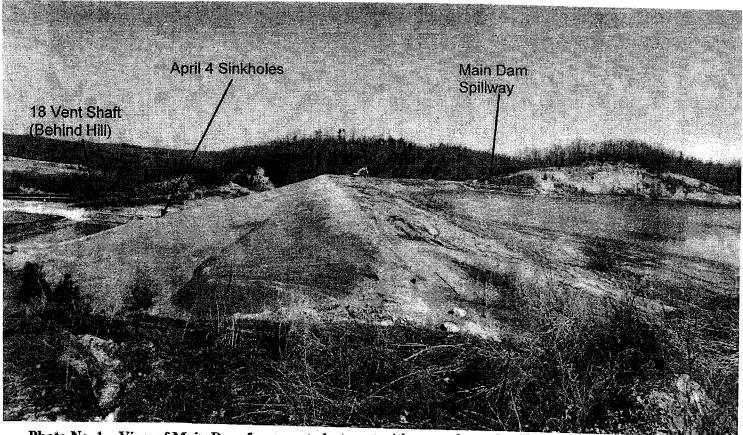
View of Main Dam from west abutment with open-channel spillways and location of sinkholes shown.
